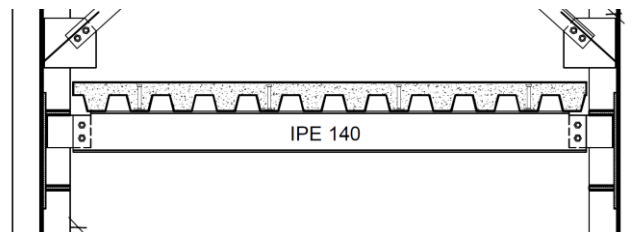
Building mock-up: detail of the connection between the deck and the secondary beams
